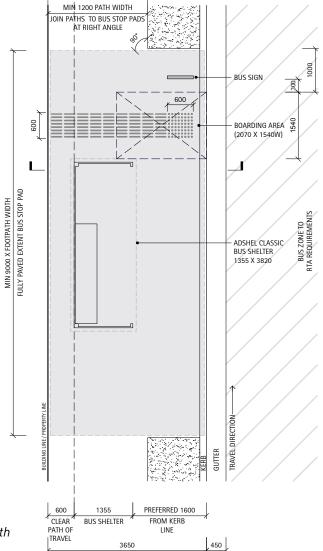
Bus Shelter on One Sided Streets with Standard Width Footpath: Adshel Classic
